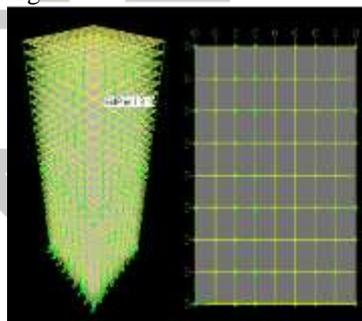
Plan and 3D view of the building model with Floating Column and Bracing System
